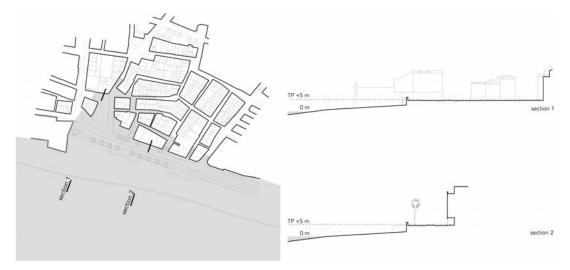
Sesimbra seashore street. Detail plan and cross sections considering a +5m sea level rise. Source: (Forma Urbis Lab and Author)
